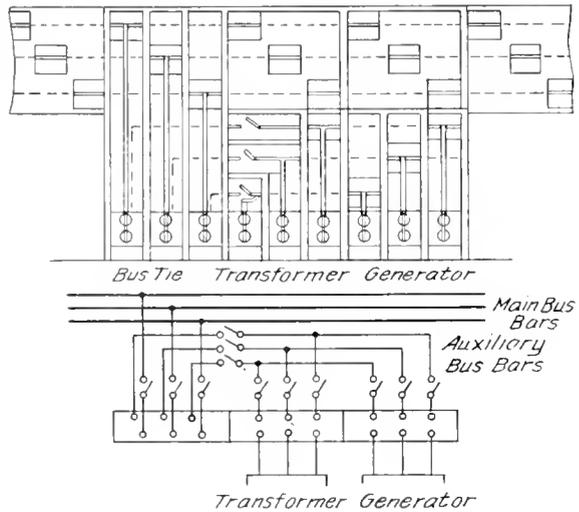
Design for Locating Switching Equipment on Gallery Forming Roof of Transformer Room
